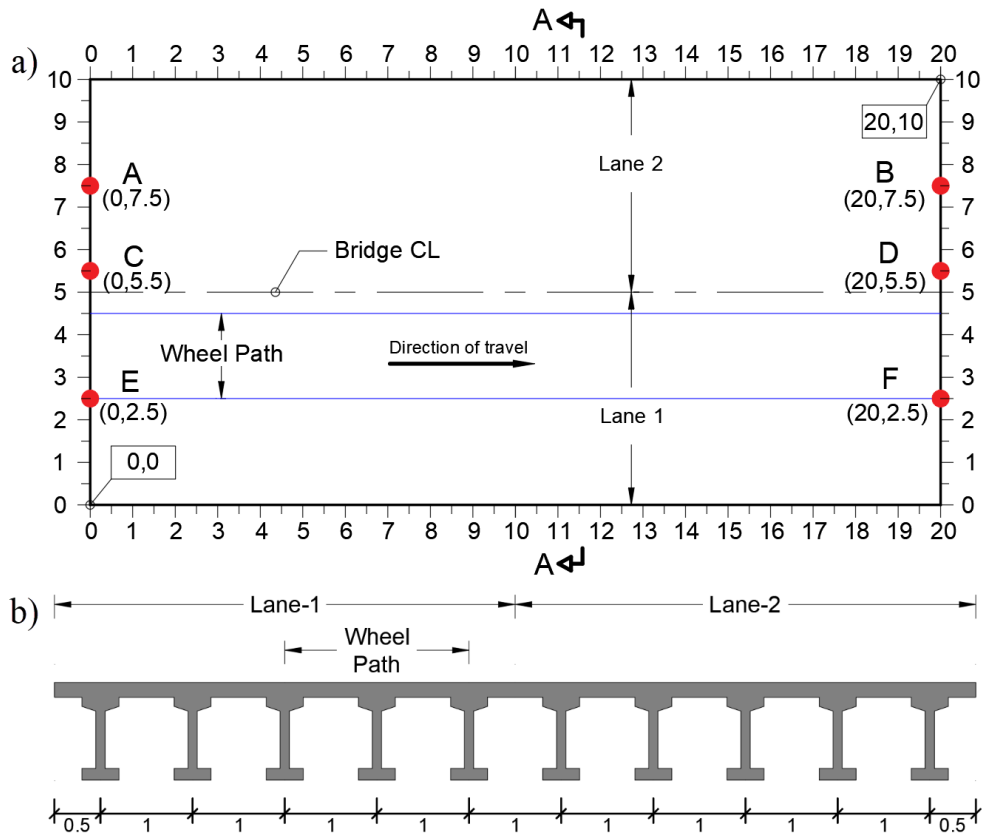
Schematic of bridge modelled in simulations (coordinates and dimensions in m) (a) Plan view (b) Cross – section (Section A-A)
